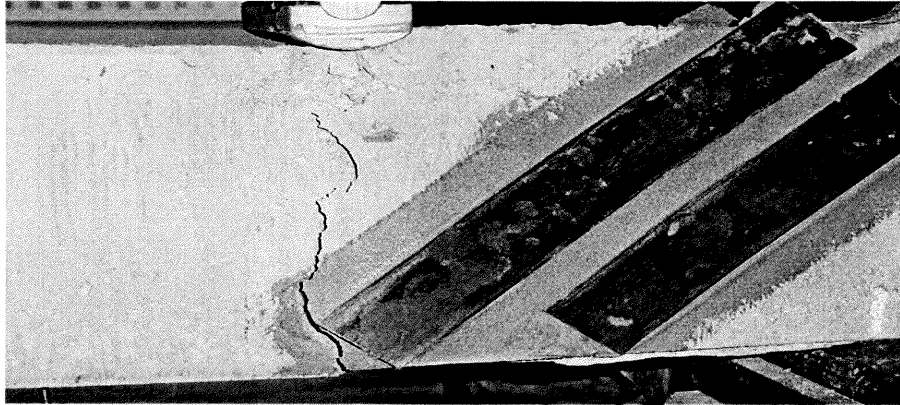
Failure of beam 2-4 with 45 degree aligned CFRP at right support
